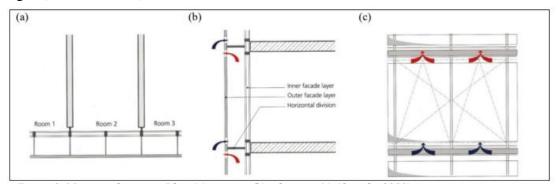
Box Window Type: (a) plan, (b) section, (c) elevation (Azarbayjani, 2010)
